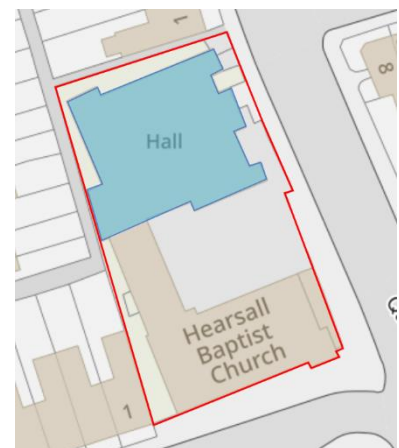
Site plan showing Former Hearsall Baptist Church in blue.
